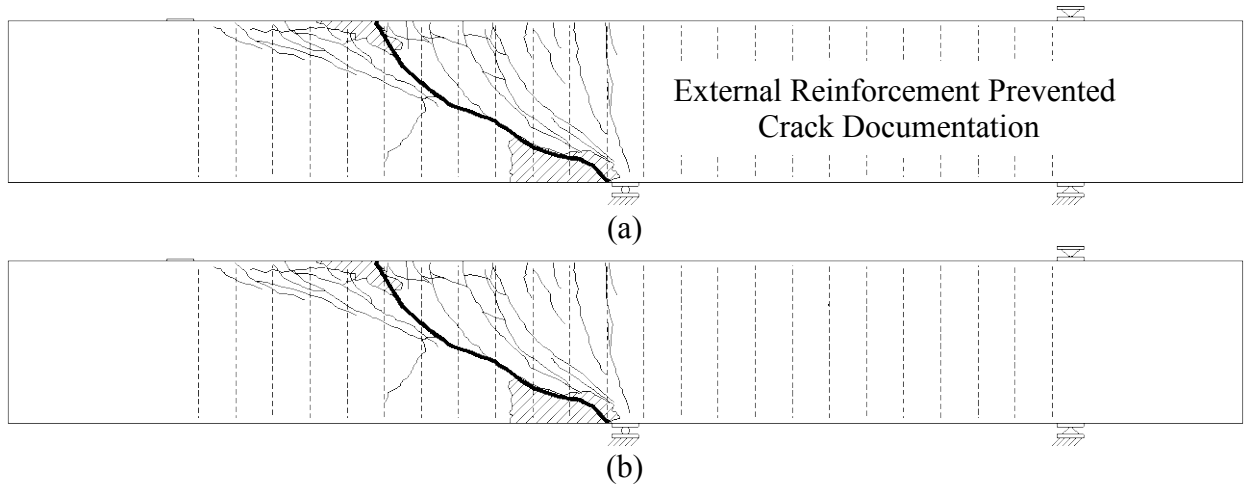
Observed damage in specimen P2S11, (a) front side, (b) back side
